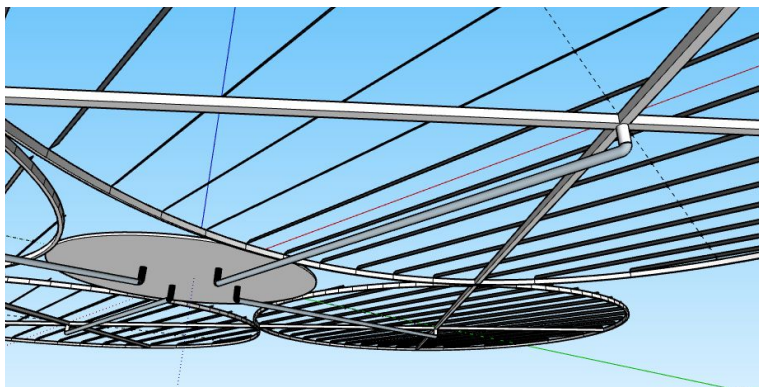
Detail of the Beams Connecting the Center Platform with the Rotating Platforms
